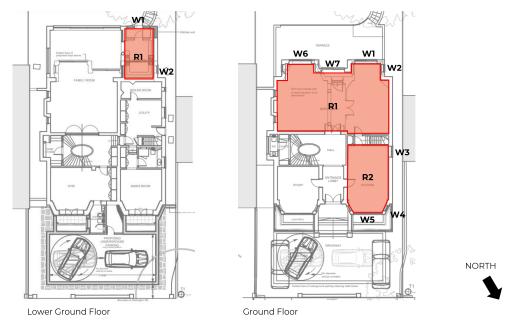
59 Redington Road layout drawings Lower Ground Floor and Ground Floor (habitable rooms and adjoining windows assessed are highlighted).
